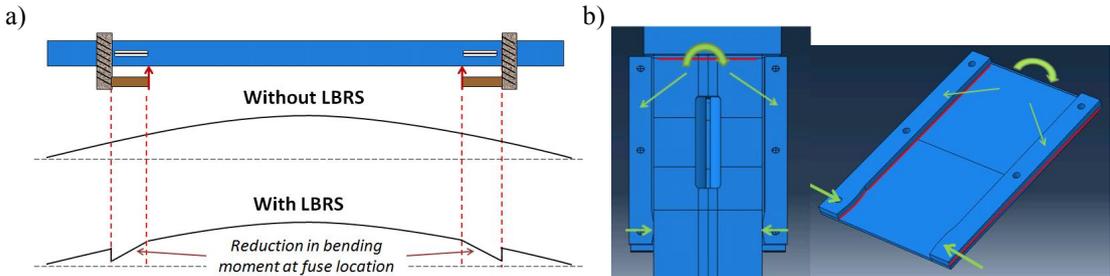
a) Brace plan view with bending moment demand on the brace without and with LBRS; b) Moment resisted by the outer plates by the welded connection and transverse contact bearing.
